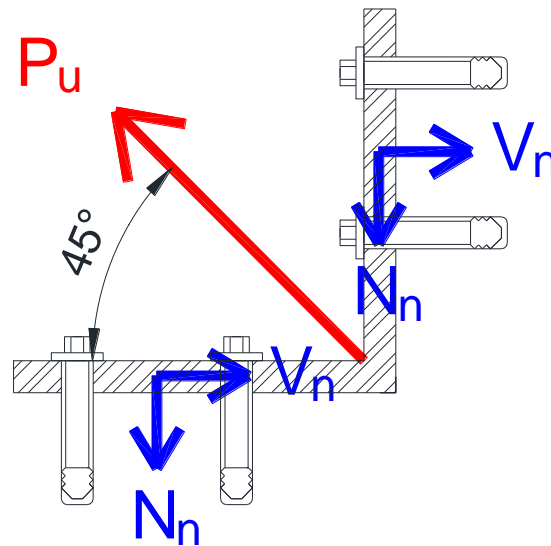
Load Acting on Steel Angle and Anchor Bolt Group.
